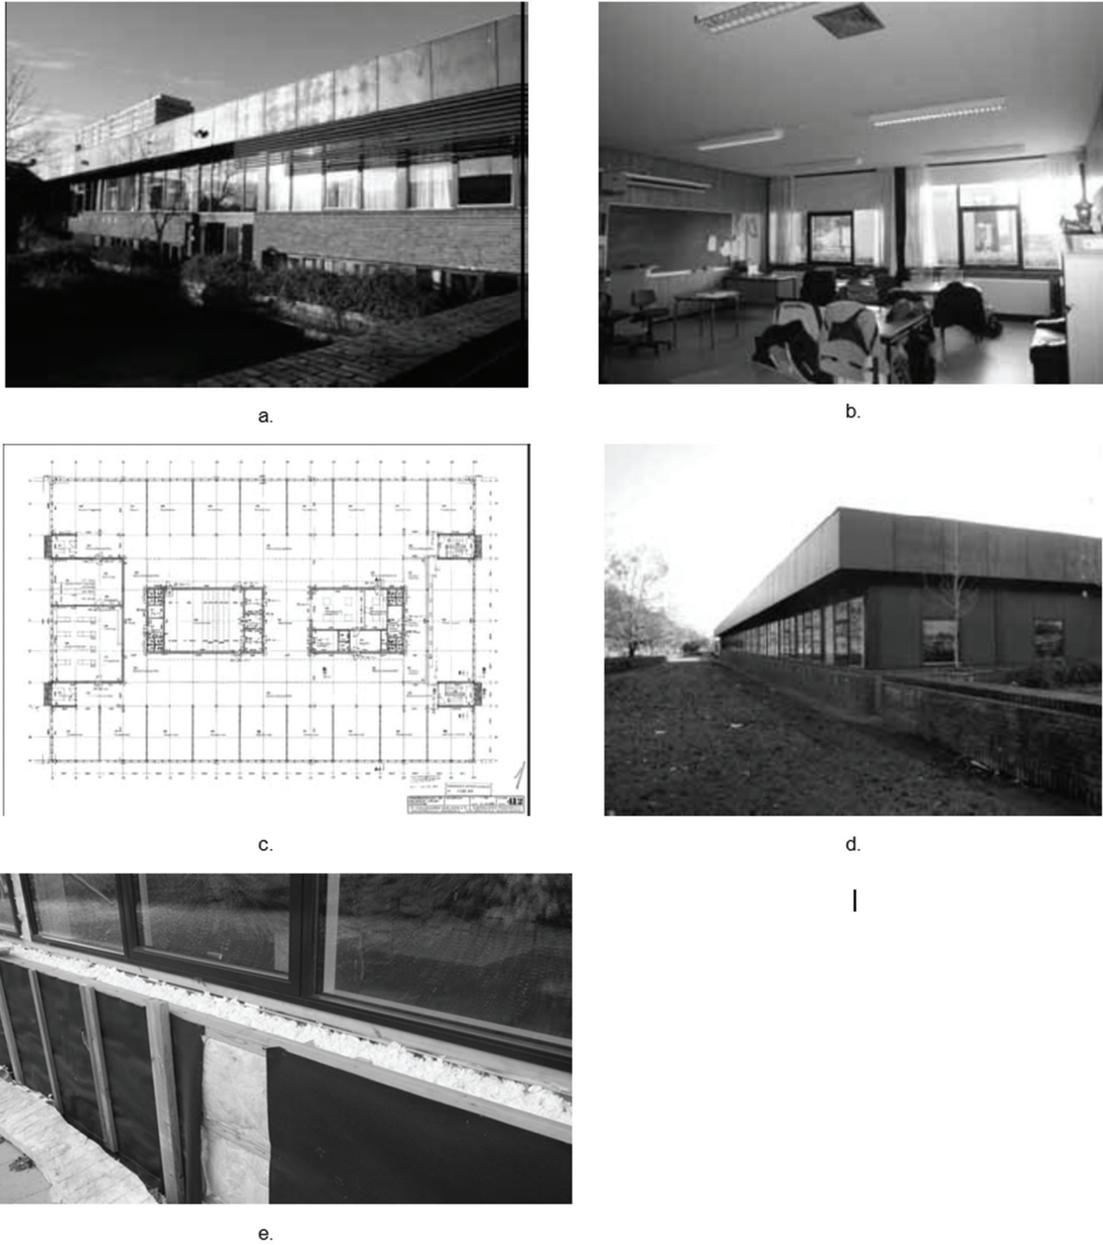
Hedegaards School building. (a) South façade. (b) Classroom. (c) Floor plan. (d) Picture from WNW. (e) External insulation with the U-value as low as $0.1 \text{ W/m}^2\text{K}$.
